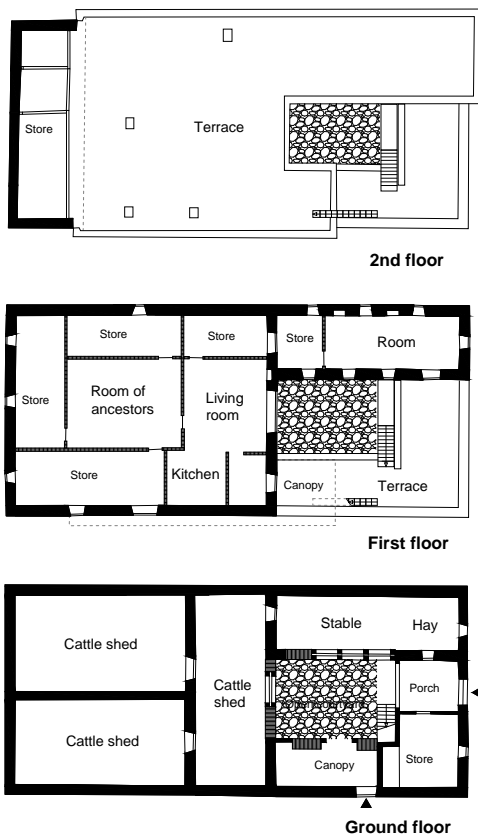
Floor plan of Thakali house in Taglung (after [16])
